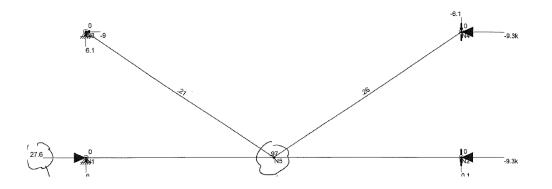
Engineering Drawing. Example wind loading of k-frame Diaphragm
